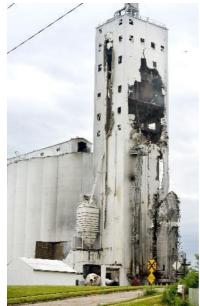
Explosion of bucket elevator (ref. https://siouxcityjournal.com)
